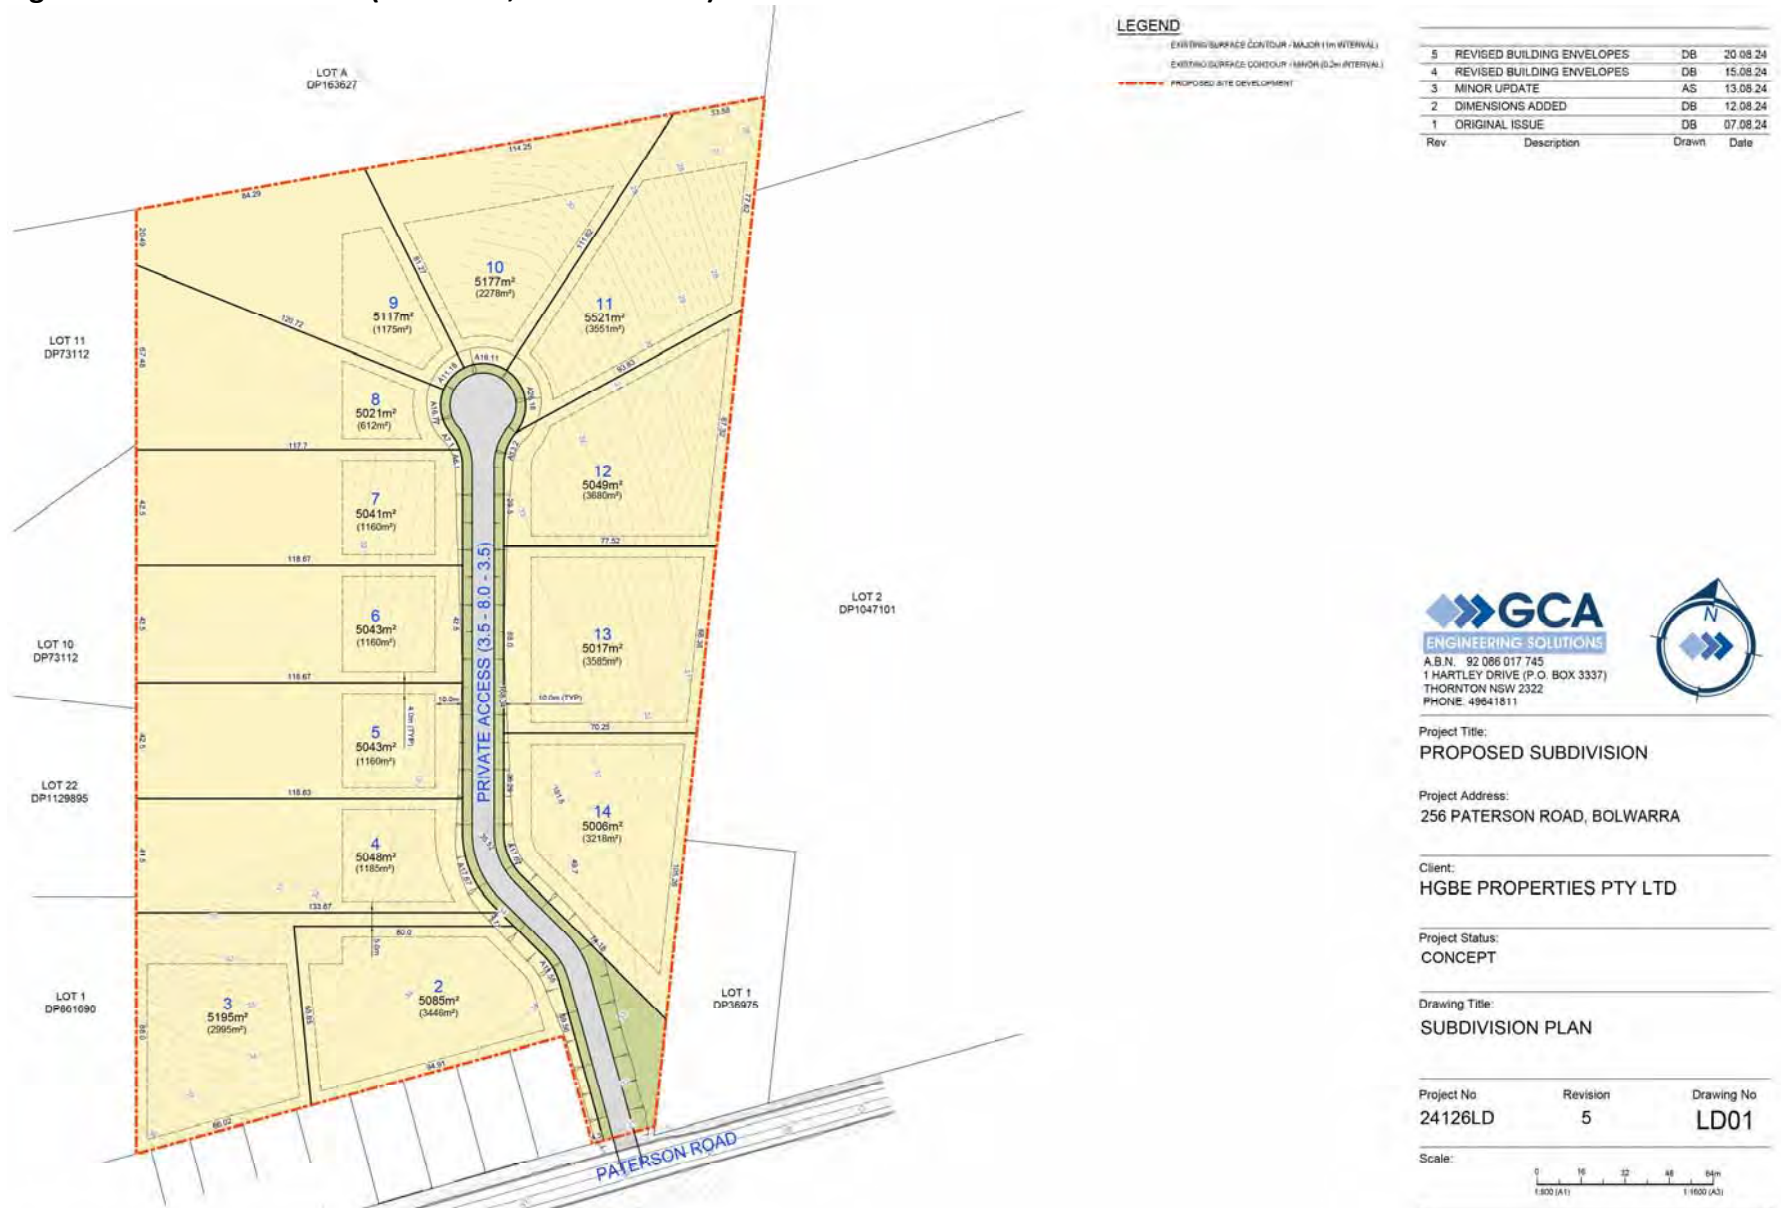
Subdivision Plan (from GCA, dated 20.8.24)
